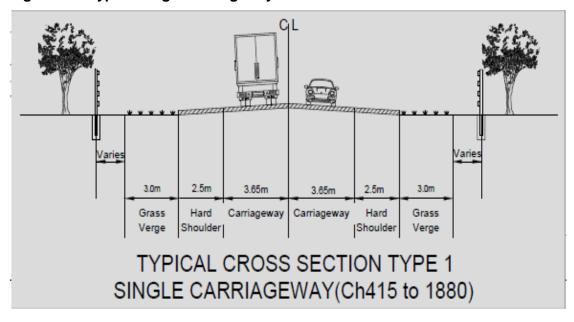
Type 1 Single Carriageway Road Cross Section
